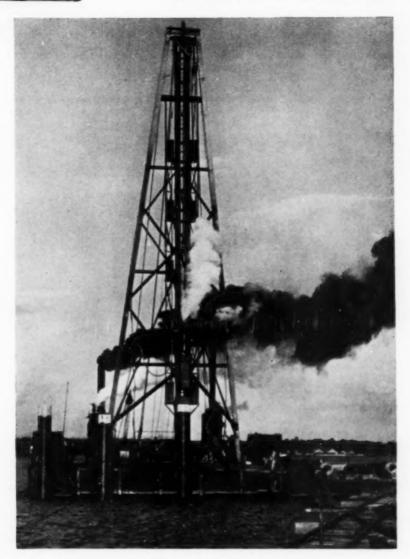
Driving Cylindrical Piles with 81-tons Hammer.
